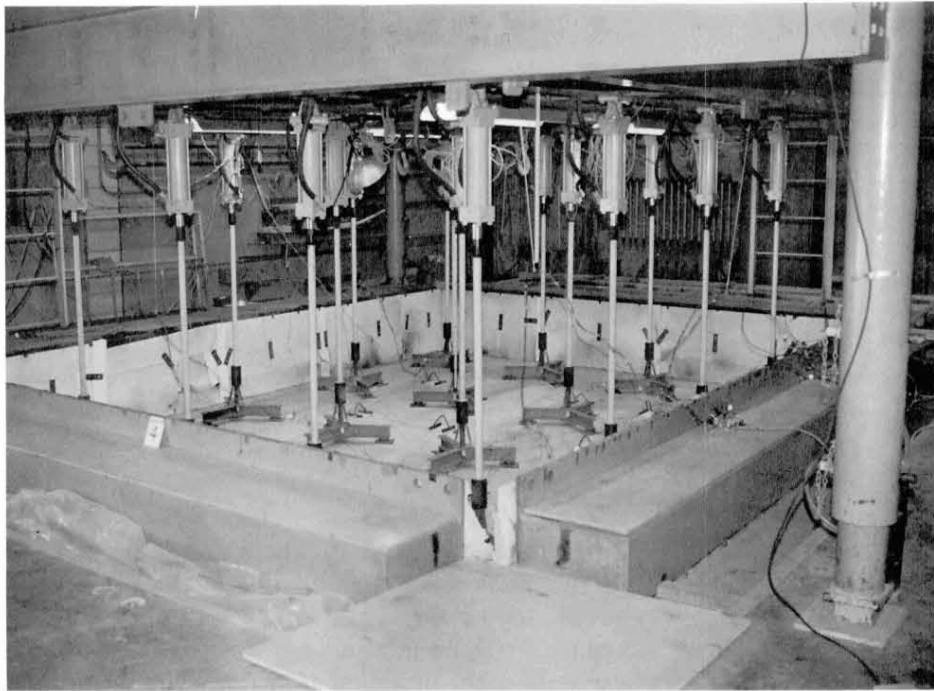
Overall view of ASTM E 119 test furnace and floor specimen.
